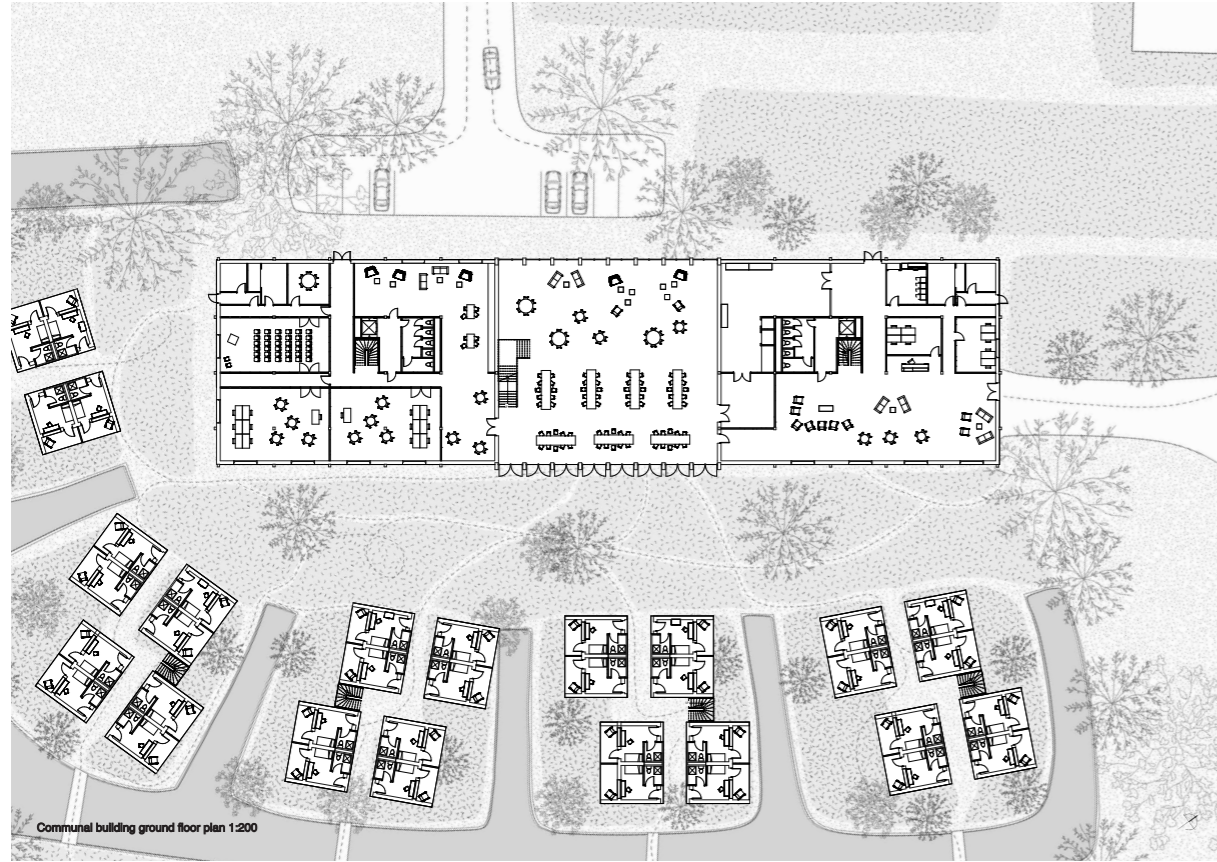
Communal building ground floor plan 1:200 rescaled. Source: Own work, 2026.
